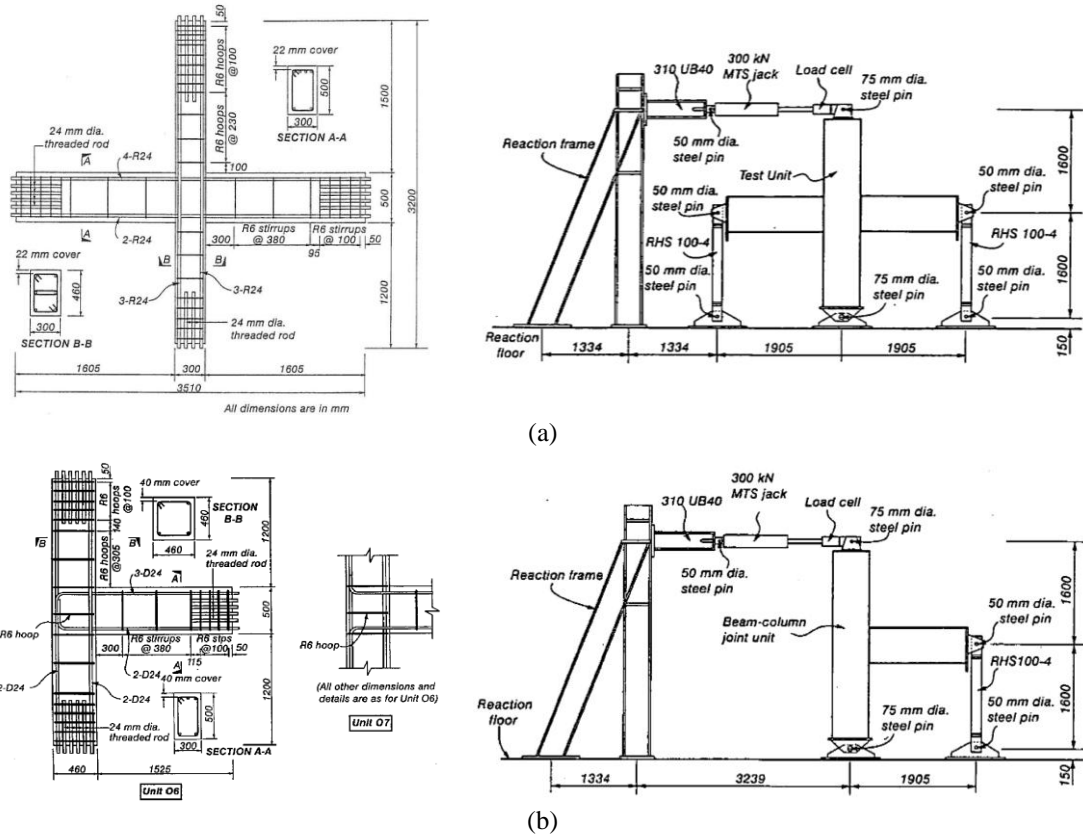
Test specimens and test setup of the experimental tests on beam-column joints with plain and deformed reinforcing bars reported in [97]: a) interior beam-column joints; b) exterior beam-column joints.
